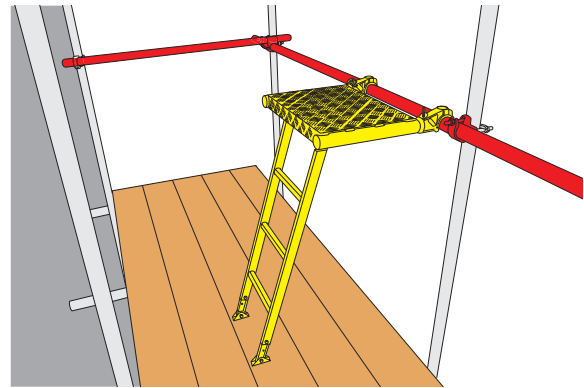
Examples of a scaffolders' step used to install guardrails in advance.
